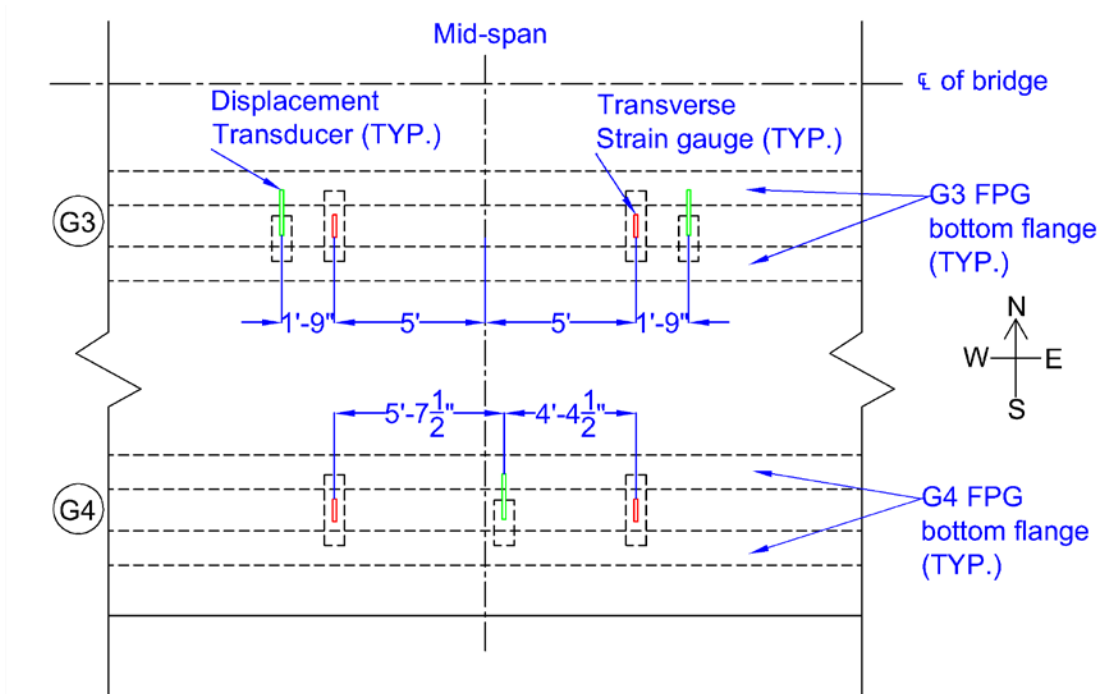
Plan view of bridge showing locations of transverse strain gauges on tie-plates and displacement transducer between bottom flange
